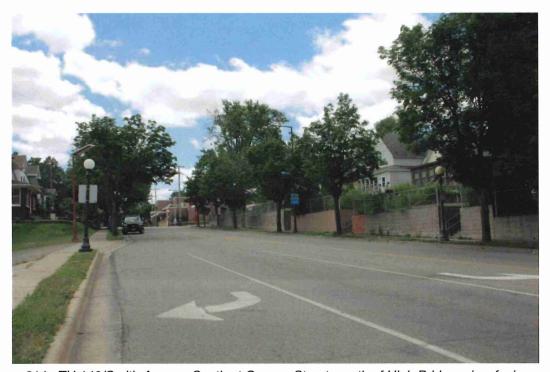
TH 149/Smith Avenue South at George Street, south of High Bridge, view facing south.
